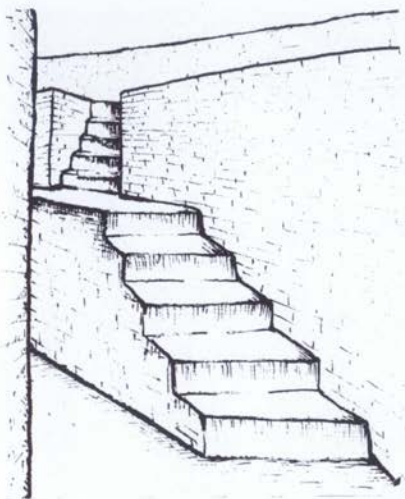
Stair to the rampart walk in the north (Fig. 102). Sketch.
